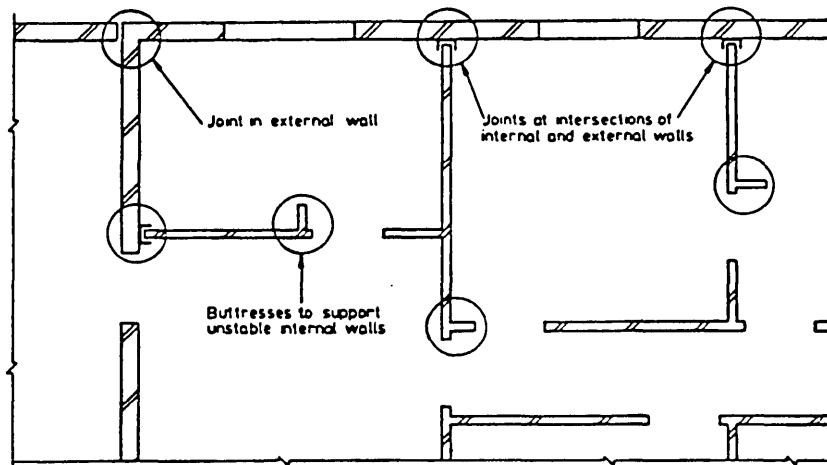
Location of joints in split design of masonry buildings (after Webb,1969).
